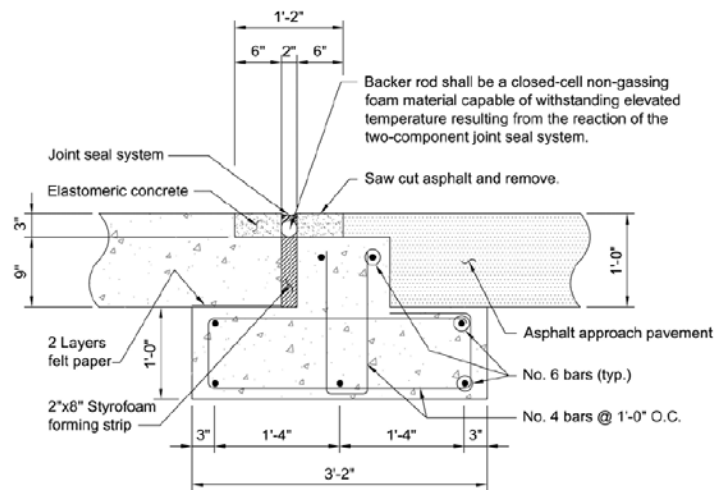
Sleeper slab details proposed by Wassermann and Walker (1996)
